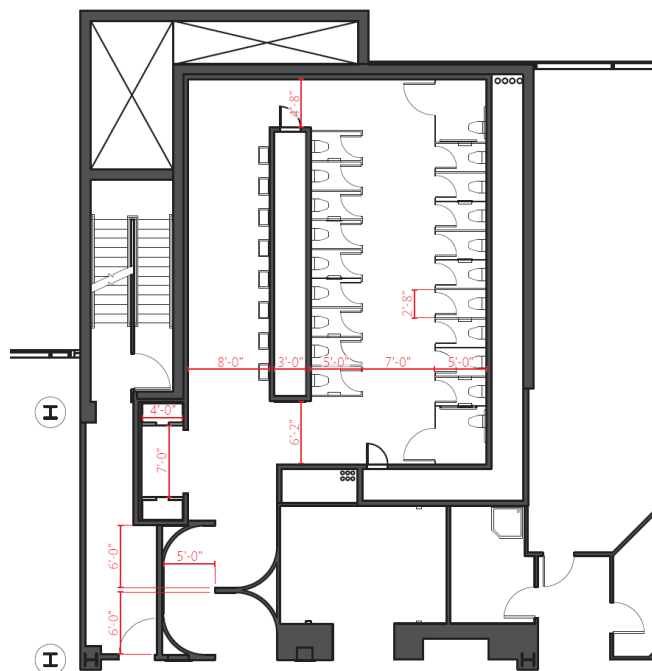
Example Existing Restroom Plan – Concourse B, Center Core
